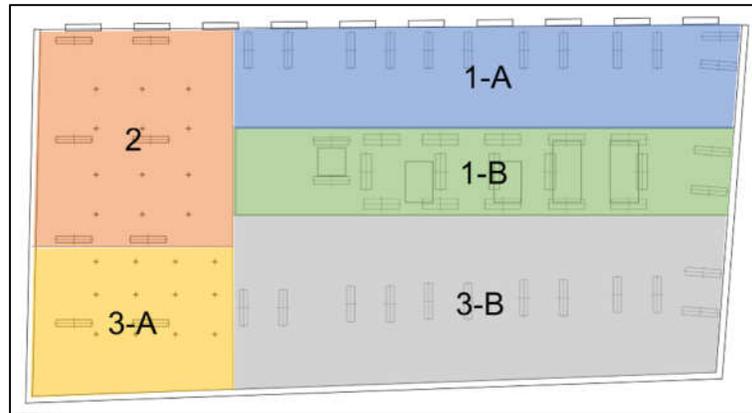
Division of the excavation area to prevent bottom uplift failure.
